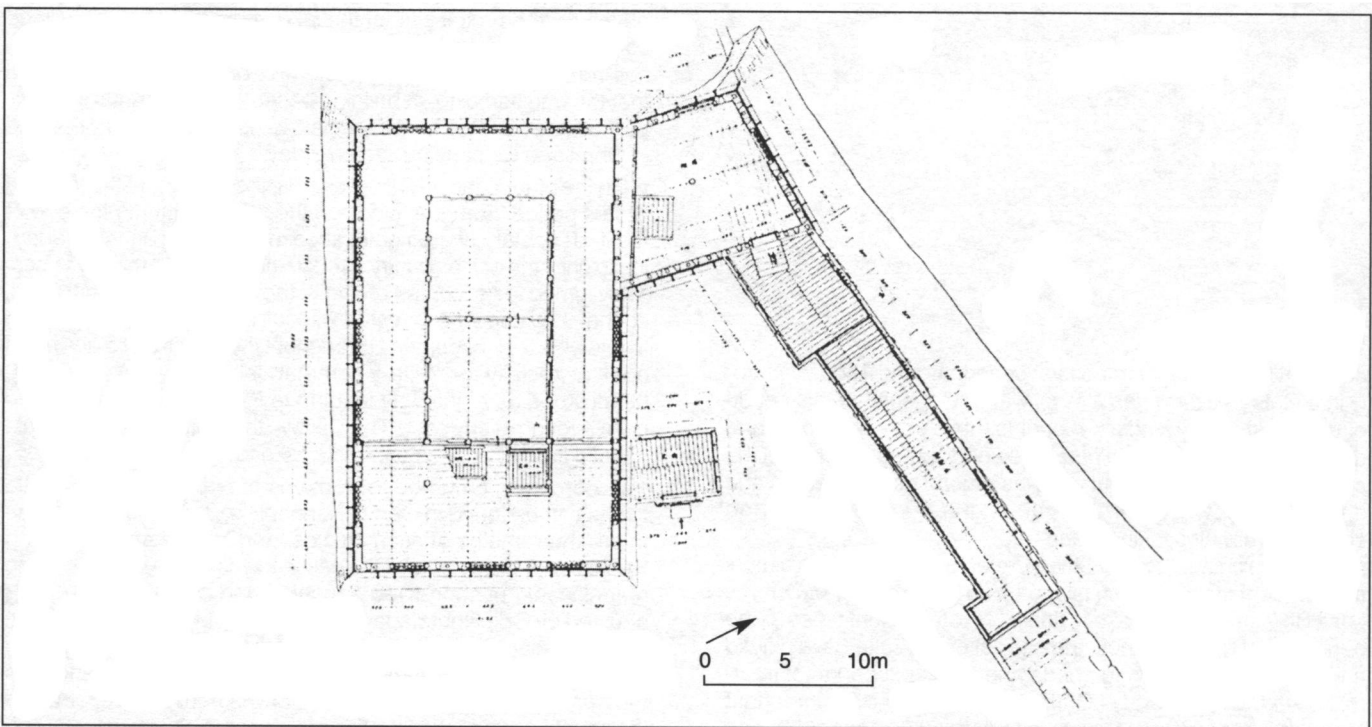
Plan of first storey, Tenshu, Hikone Castle.
